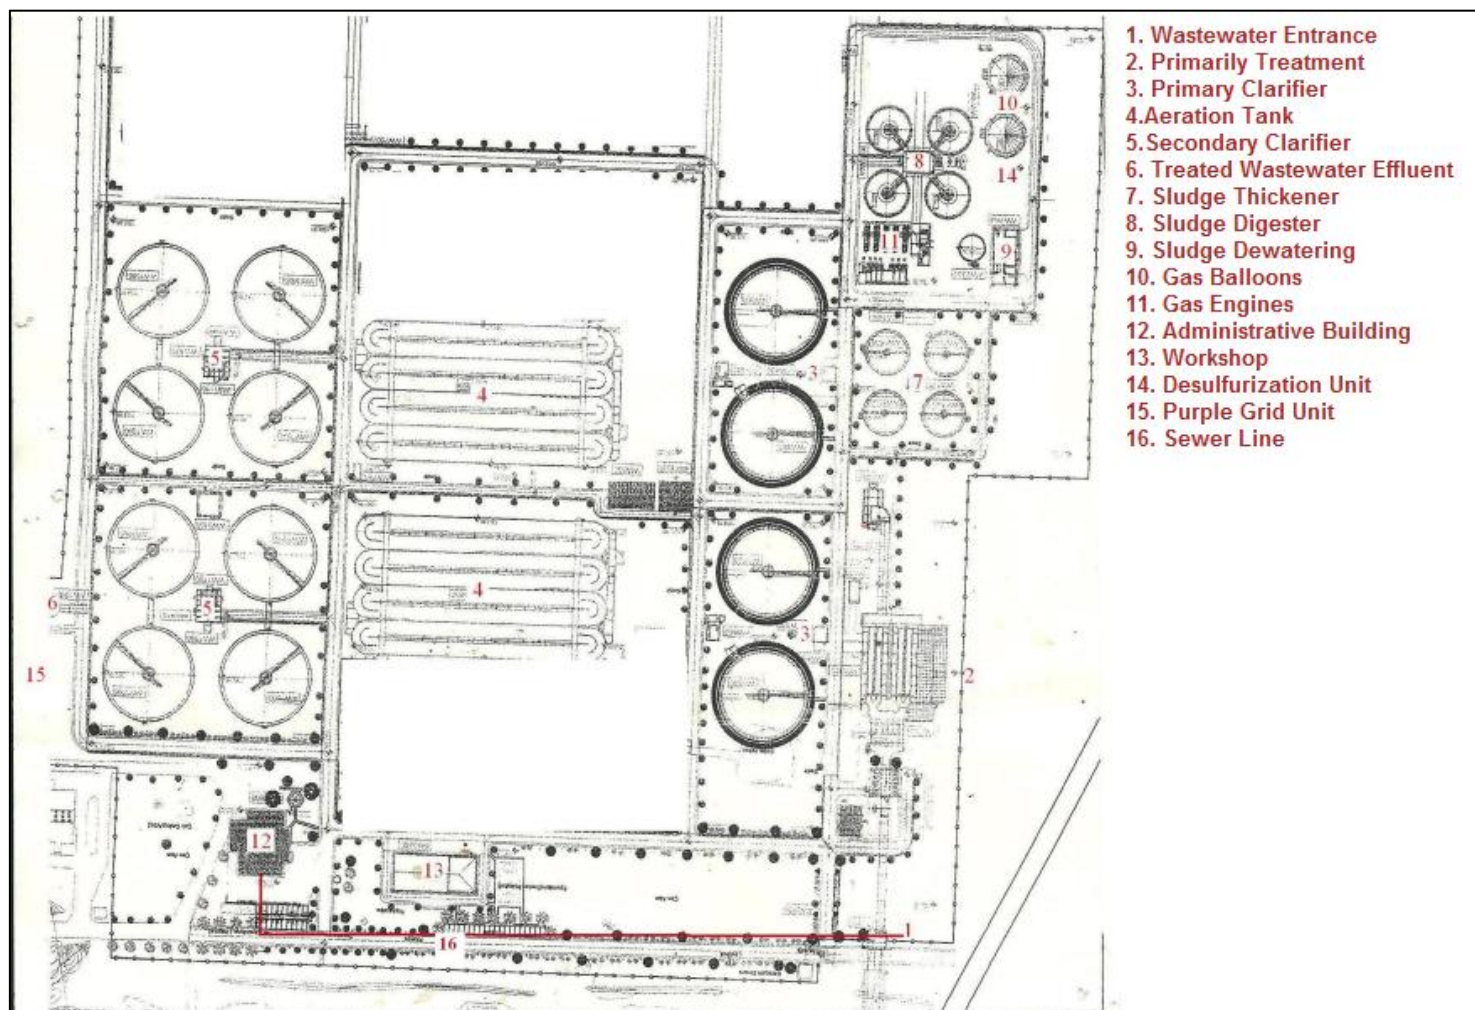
Layout of the Existing Wastewater Treatment Plant
